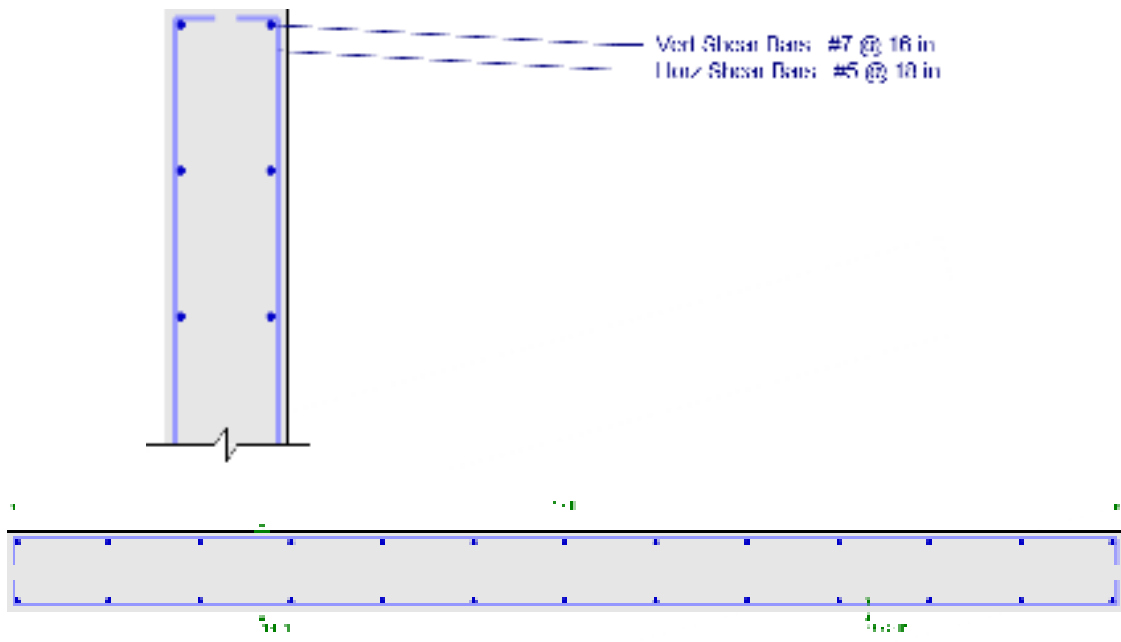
Building (B10-12S-M-S) Special RC Shear Reinforcement Details; Wall Section for Floors 7-9
